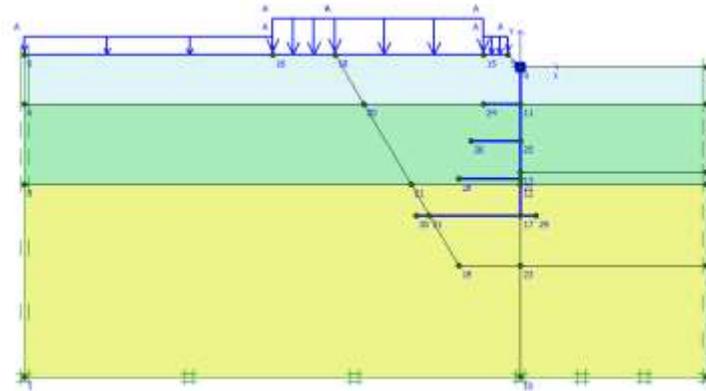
Modeling retaining wall with heel in PLAXIS software
